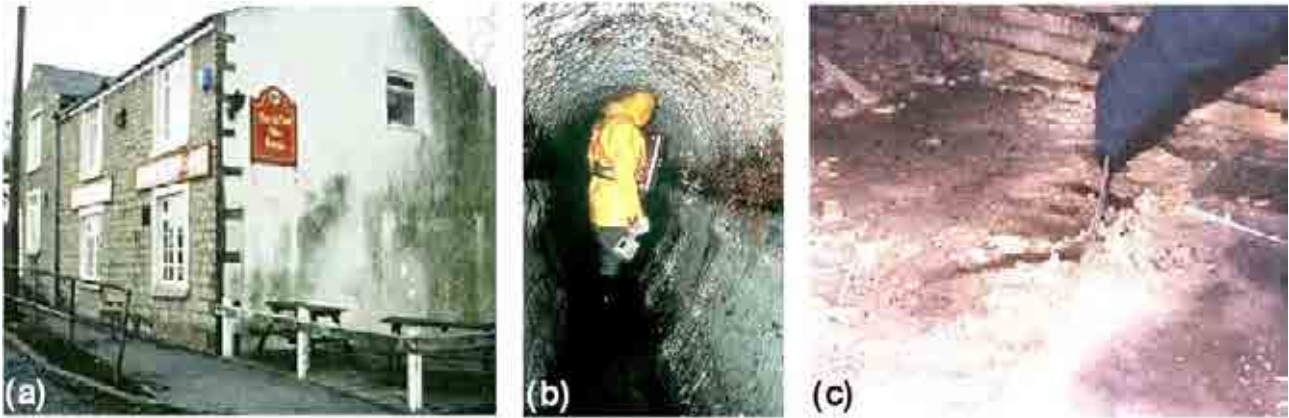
Concrete biological attack: (a) algae growth on the outside wall of house [150]; (b) biogenic sulphuric acid attack in a sewer system [154]; (c) decaying concrete floor in flooded cellar [150].
